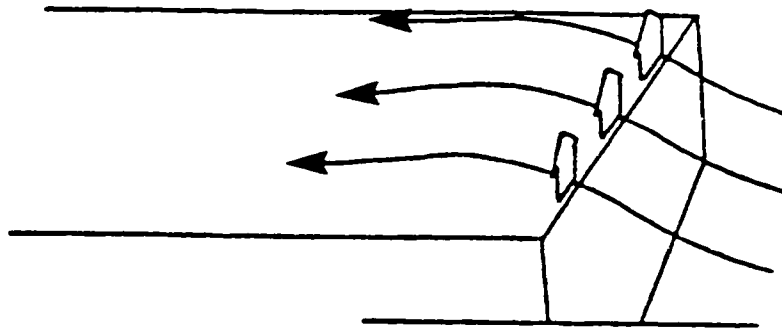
Local roof damage induced by airflow over eaves, after Council on Low-Rise Buildings (1993).
